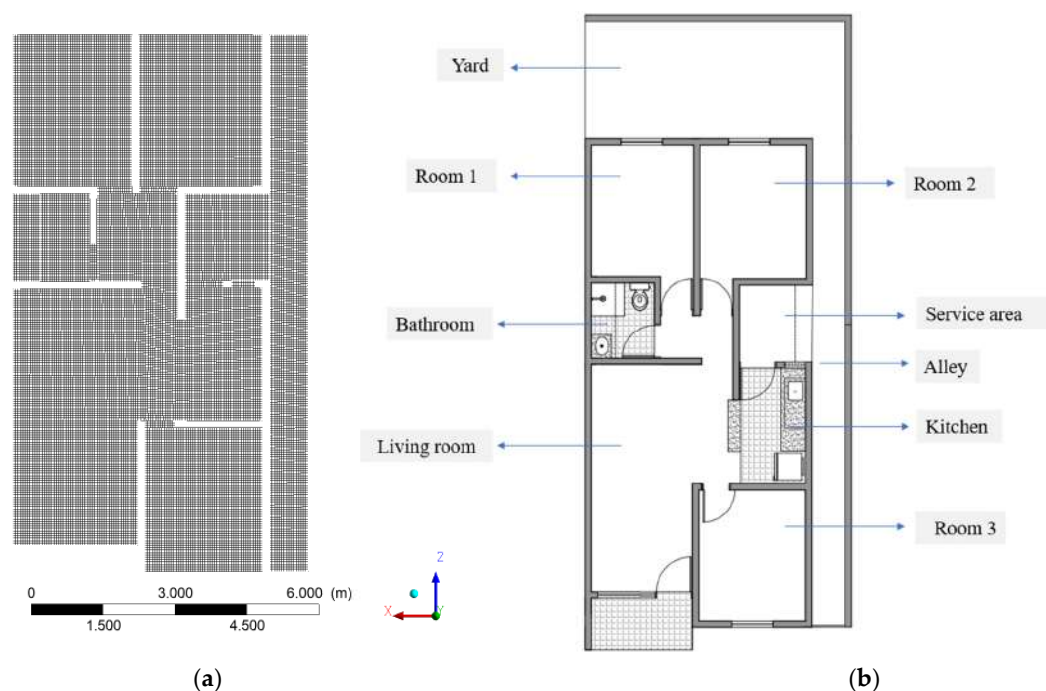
Plan of the building. (a) Mesh and (b) floor.
